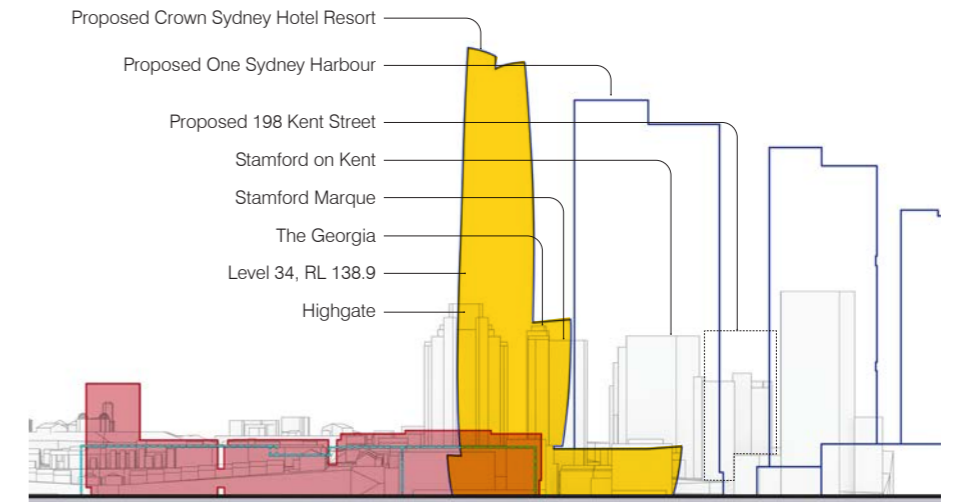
Elevation Looking East - MOD 9 with the Approved Concept Plan shown in light blue outline (Source: Modified from HASSELL diagrams (November 2018))
